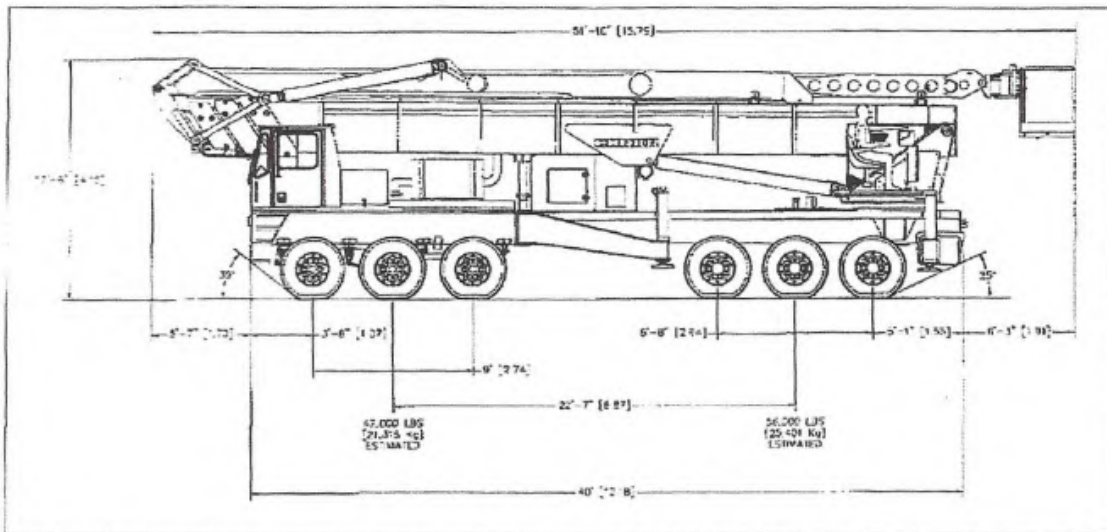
Example Aerial Lift Crane to be Used During Construction (Roadable Length 52 Feet; Width 8 Feet 6 Inches)
